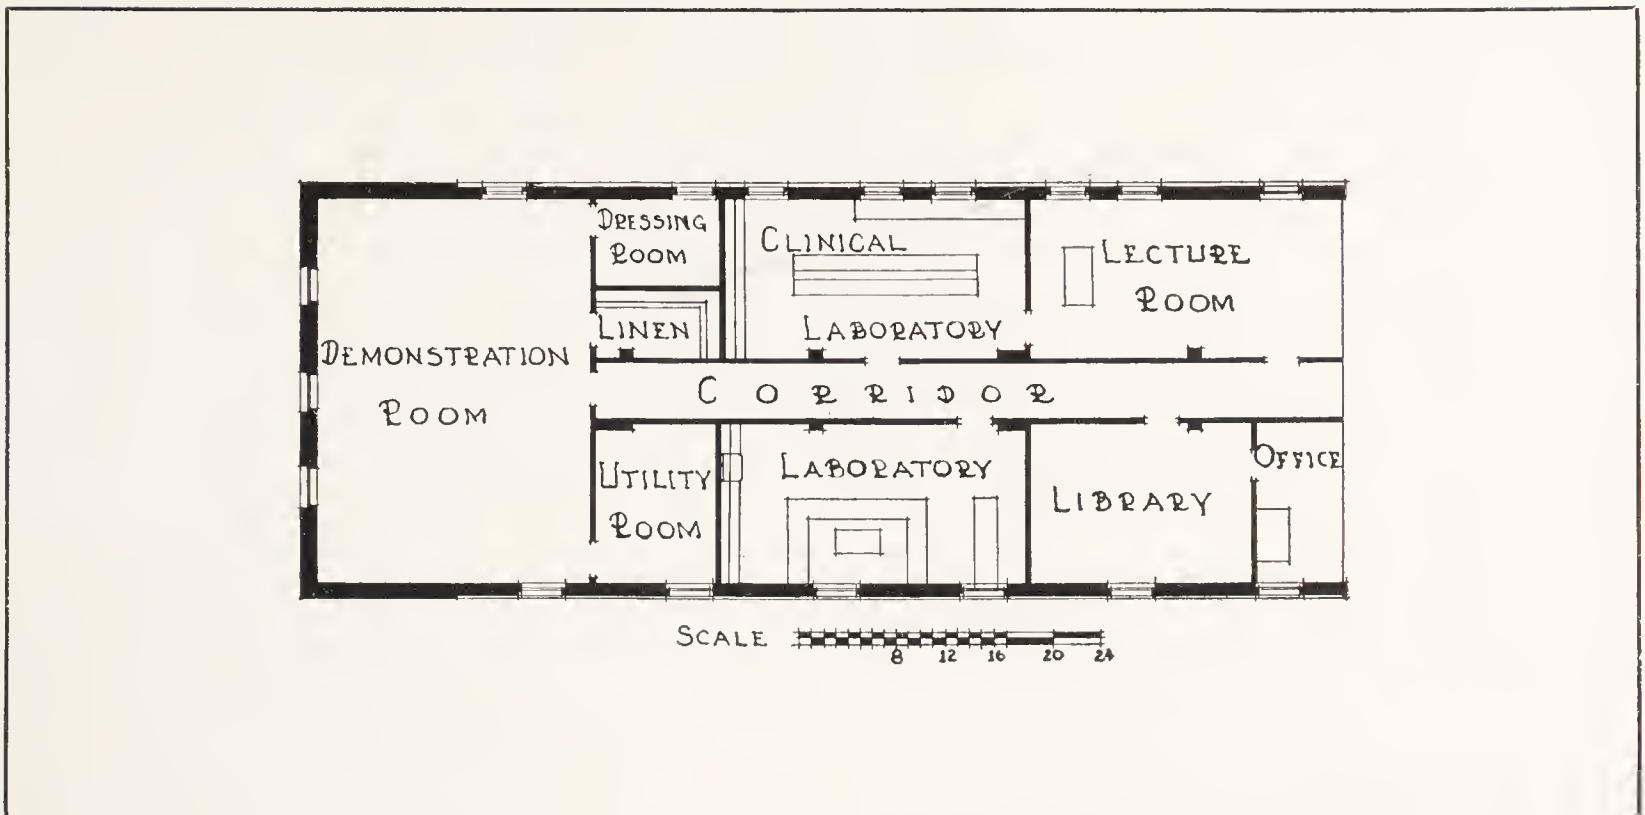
SUGGESTED PLAN FOR EDUCATIONAL BUILDING,
